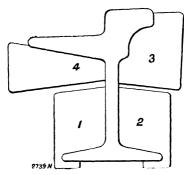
Position of Steel Lugs used in Welding Rail Joints.
